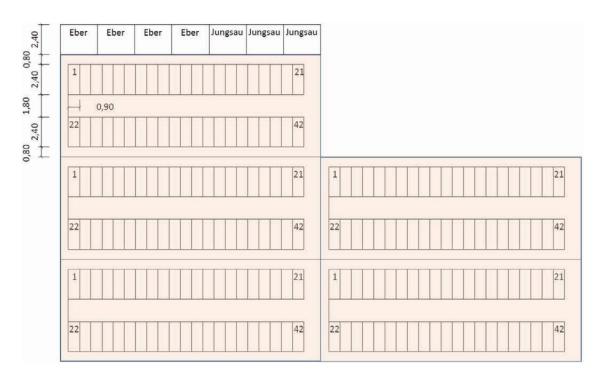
Floor plan of the service area (building 1 and building 2) with sow crates 90 cm apart and 210 instead of the original 280 animal places in 5 compartments with 42 places each (25% stock reduction)
